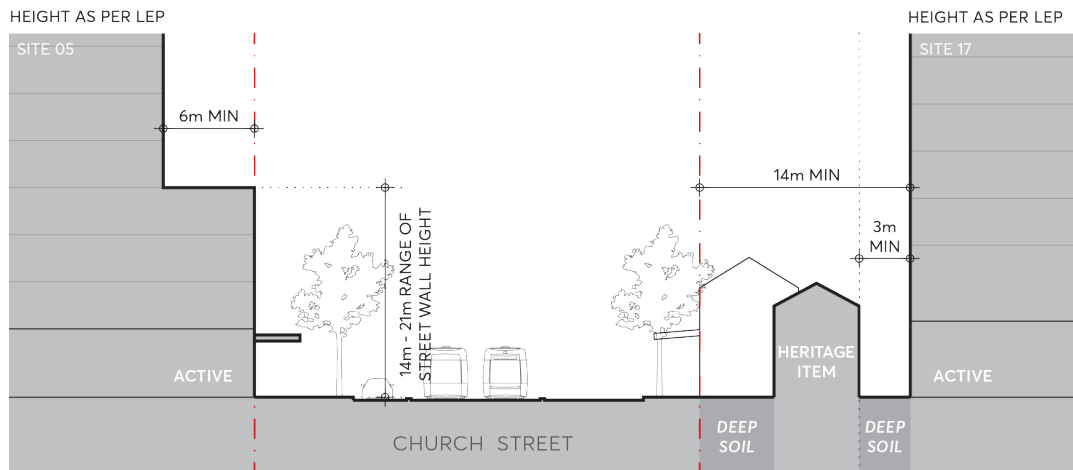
Site 17 (Section J) Setbacks and Street Wall Height
